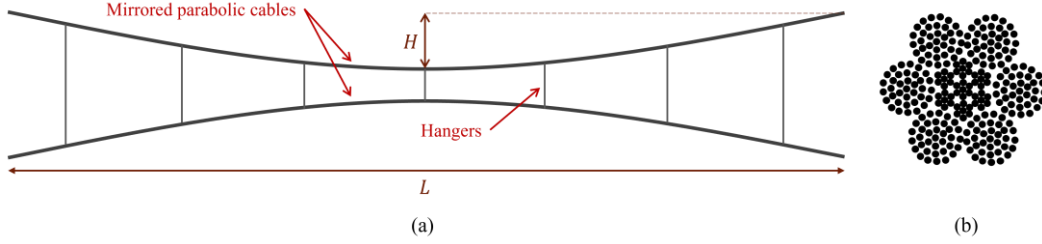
a) Cable truss b) Possible steel cable's cross-section [16].
